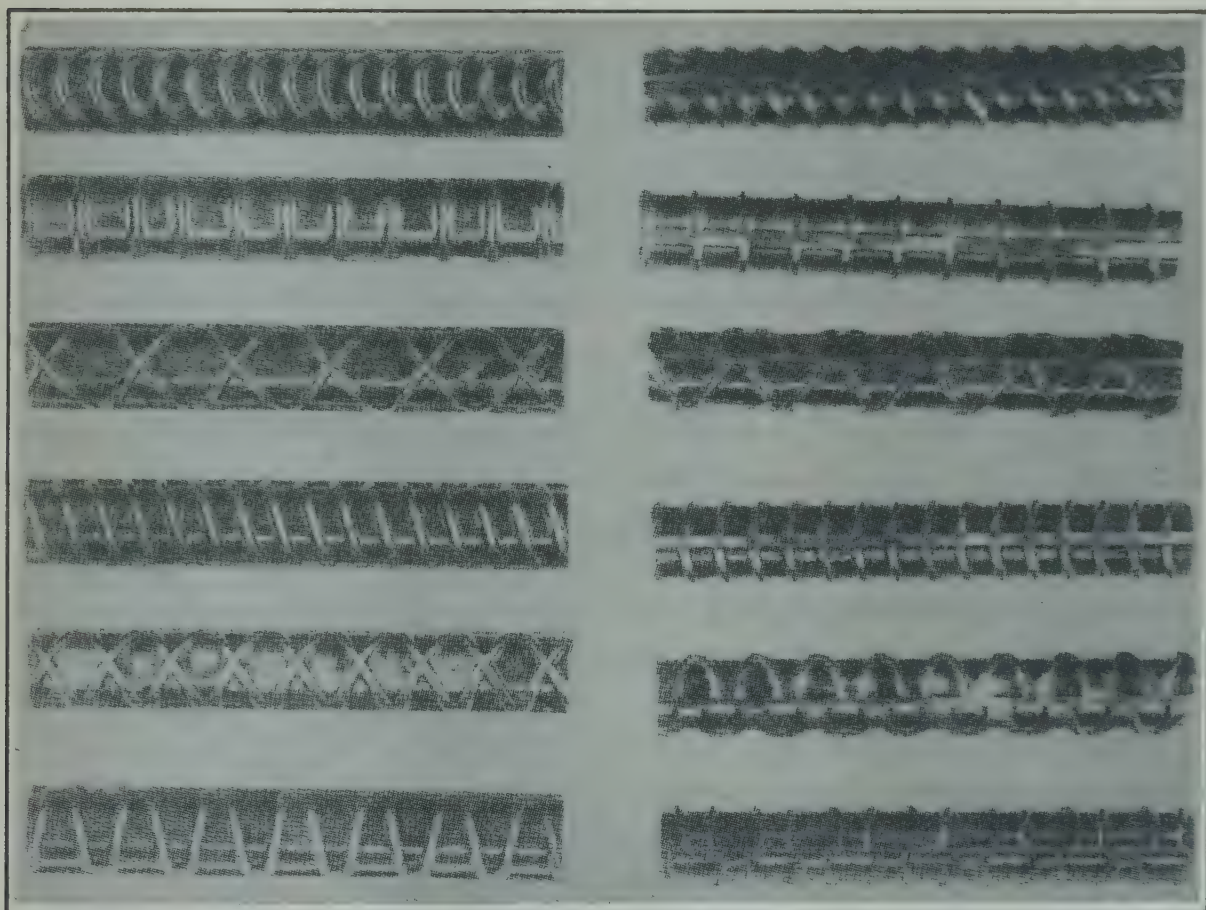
These reinforcing bars are manufactured to meet the requirements of ASTM Tentative Specifications for Minimum Requirements for the Deformations of Deformed Steel Bars for Concrete Reinforcement A 305—50T. (Courtesy of the American Iron and Steel Institute.)
